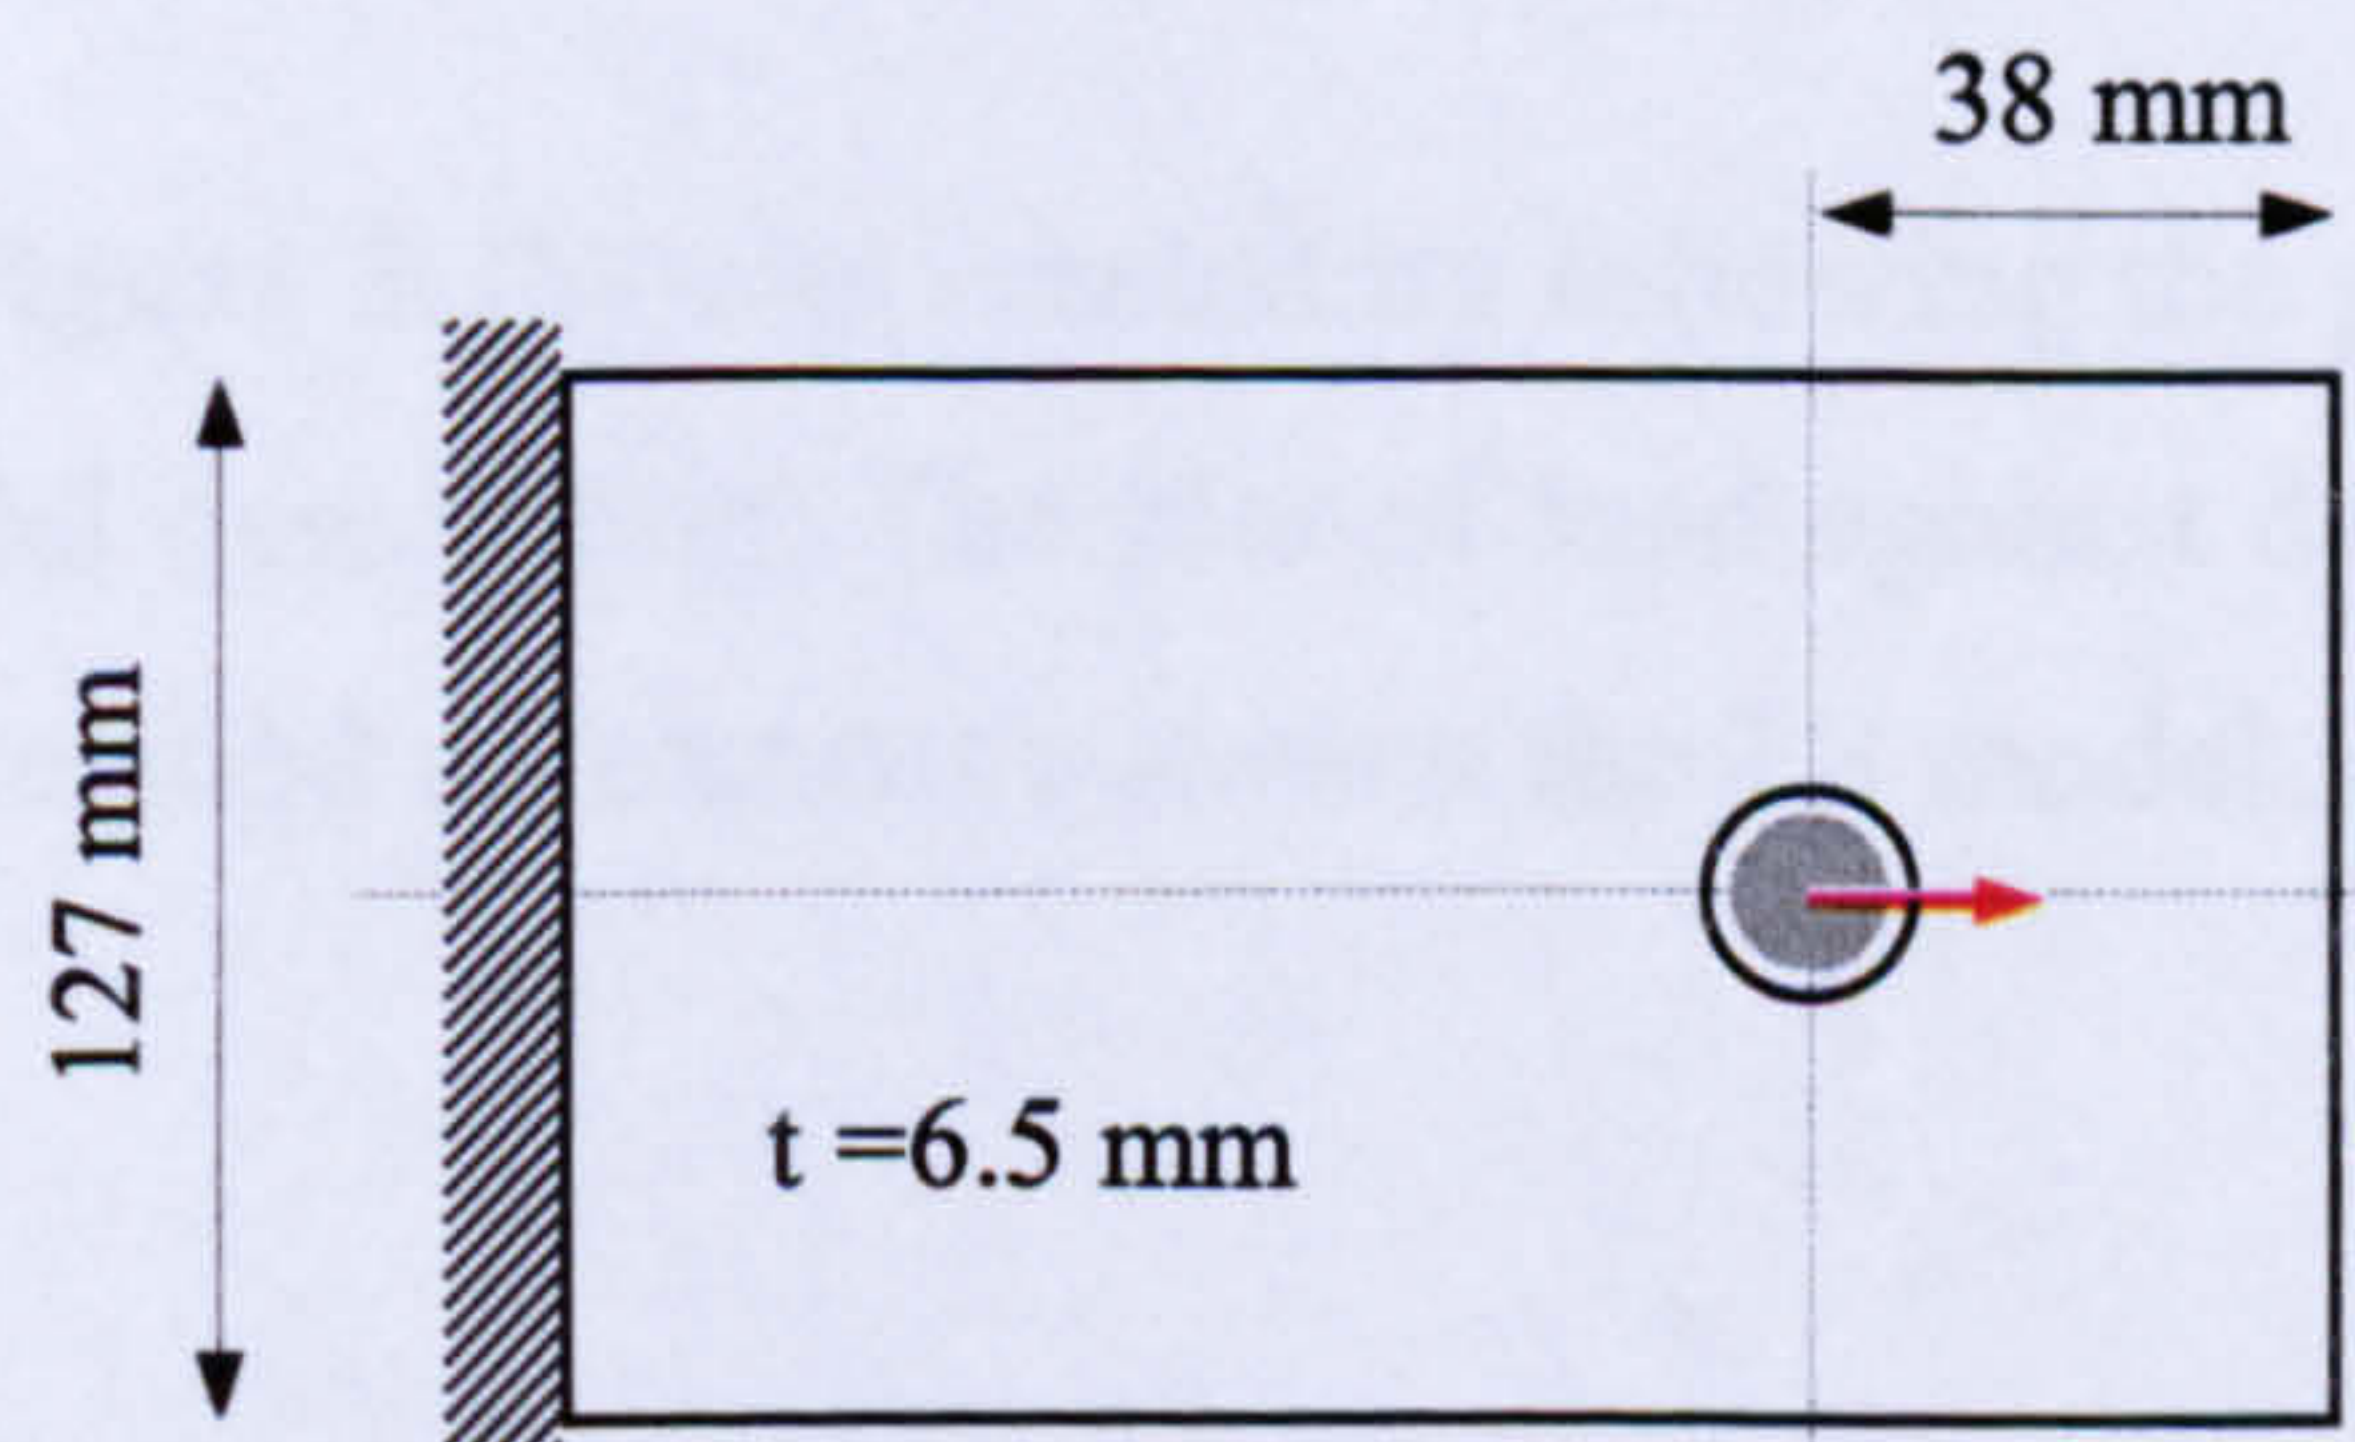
Geometrical details of Rex bearing test (No.41)
